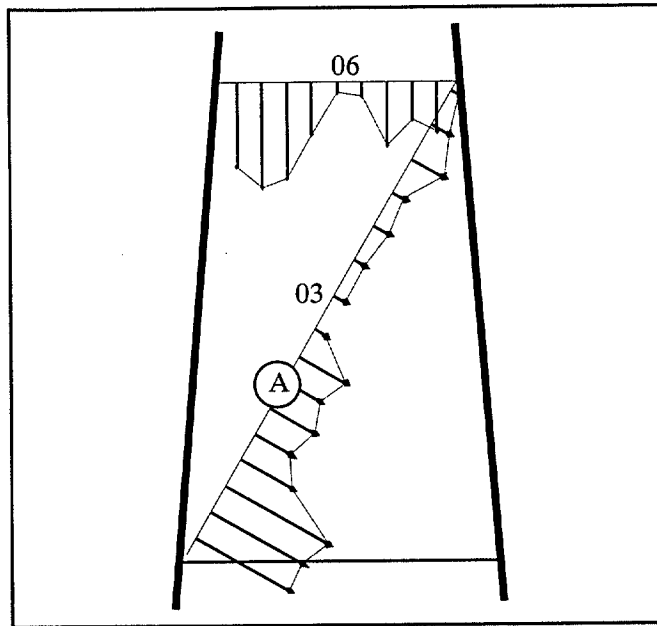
Wall Loss in Santa Fe Structure (Schematic)
